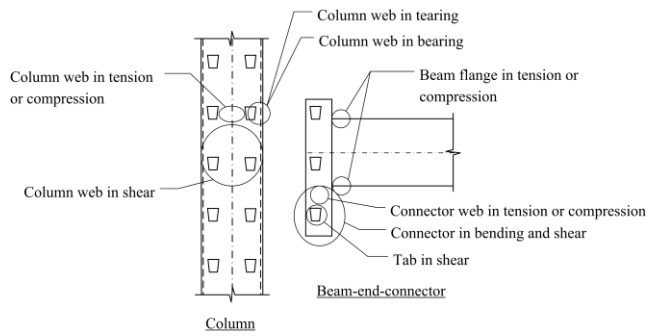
Basic components of beam-to-column connections in steel storage racks
